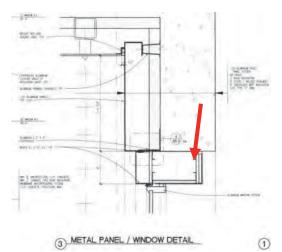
Depicts Project Record Detail depicting aluminum window system-to-.125-inch thick aluminum panel-transition-to-.125 panel archway soffit panels. Note the window system does not depict rough opening flashings at the rough opening flashing (see red arrow).
